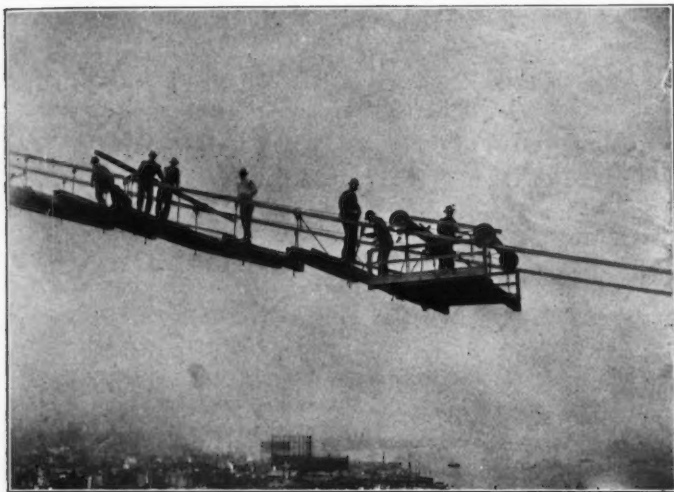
ERECTING MAIN SPAN OF FOOTBRIDGE FROM TRAVELER.
